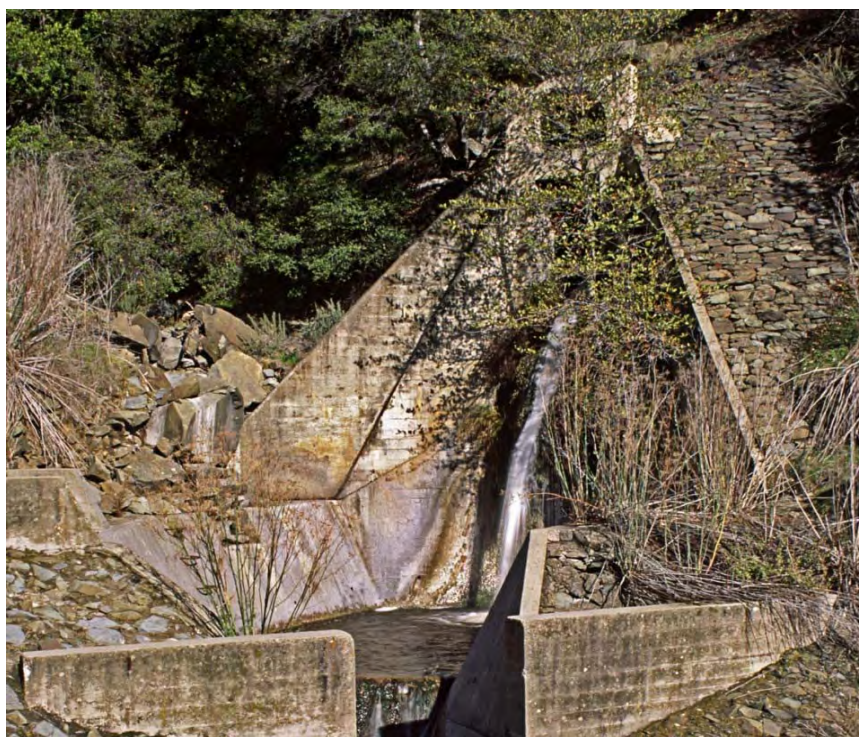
Outlet of the Alameda Creek Diversion Tunnel at Calaveras Reservoir
